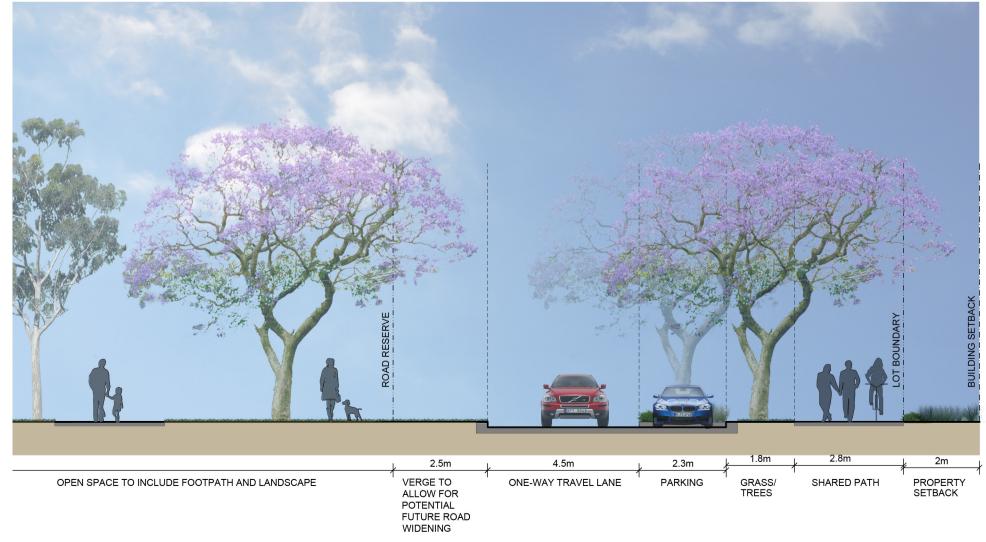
One-Way Street Park Edge_Scale 1:100 @ A3
